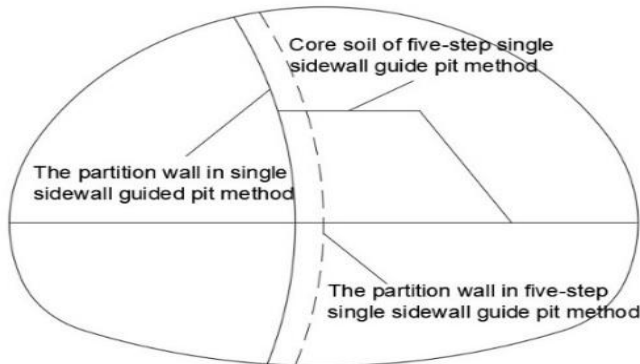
Comparison of single sidewall guide pit method and five-step single sidewall guide pit method.
